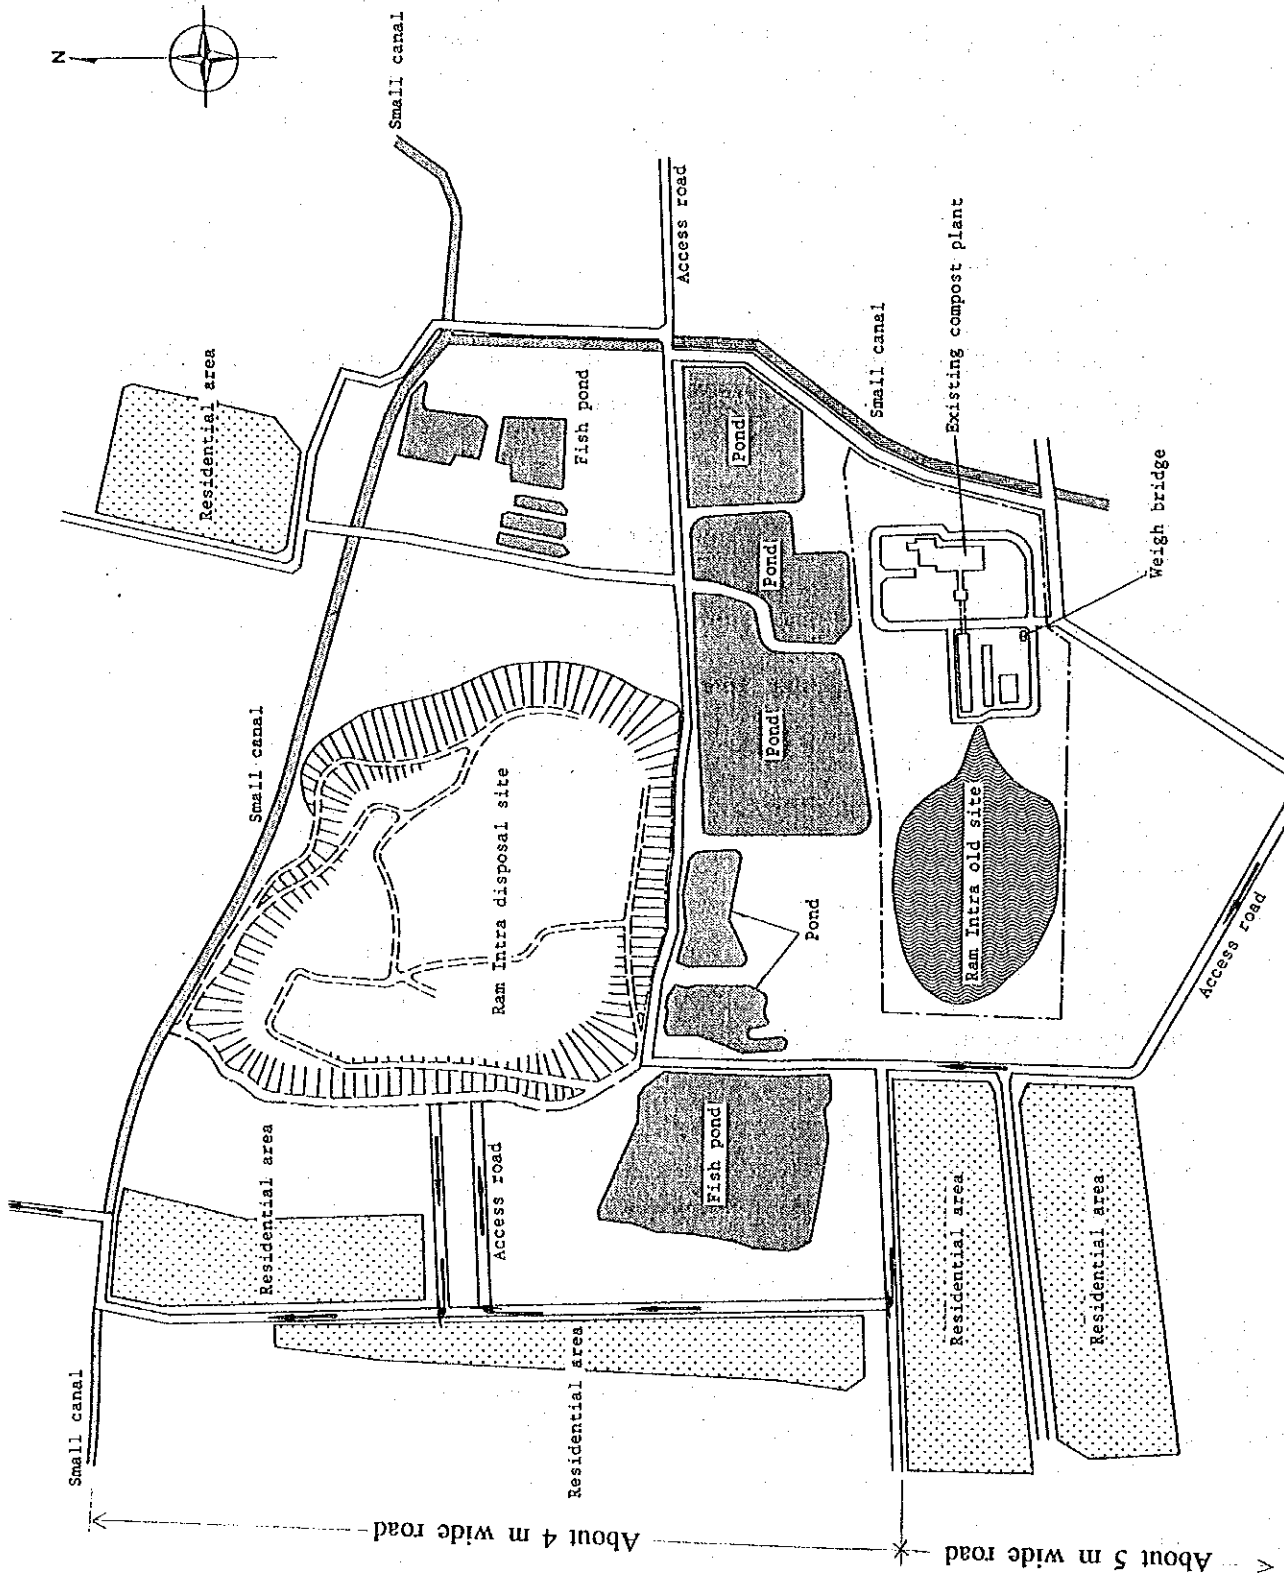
Access Road to the Planned Ram Intra Site
